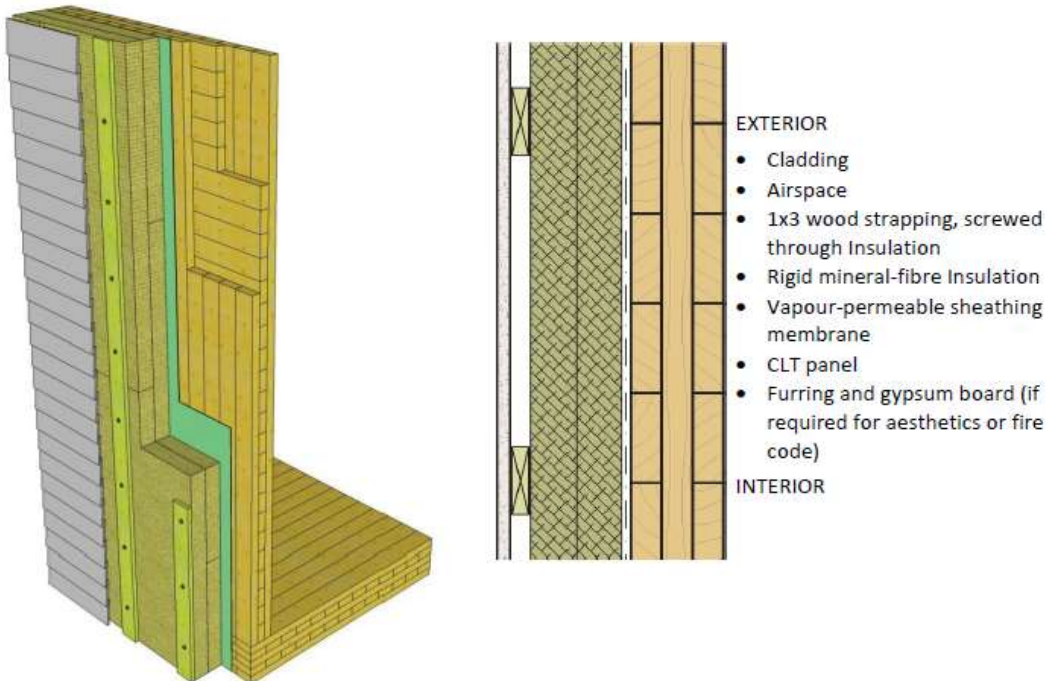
Exterior-insulated mass timber panel assembly (isometric sketch and plan view detail).
